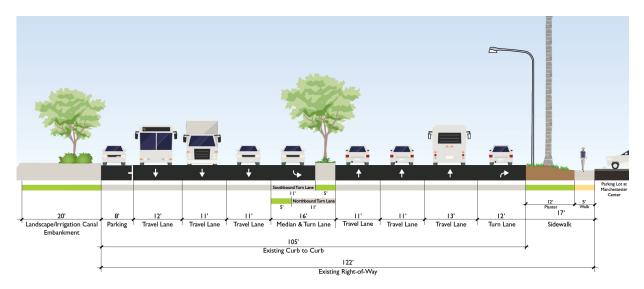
Existing Conditions Cross-section: Dayton Avenue to Shields Avenue (facing North)
